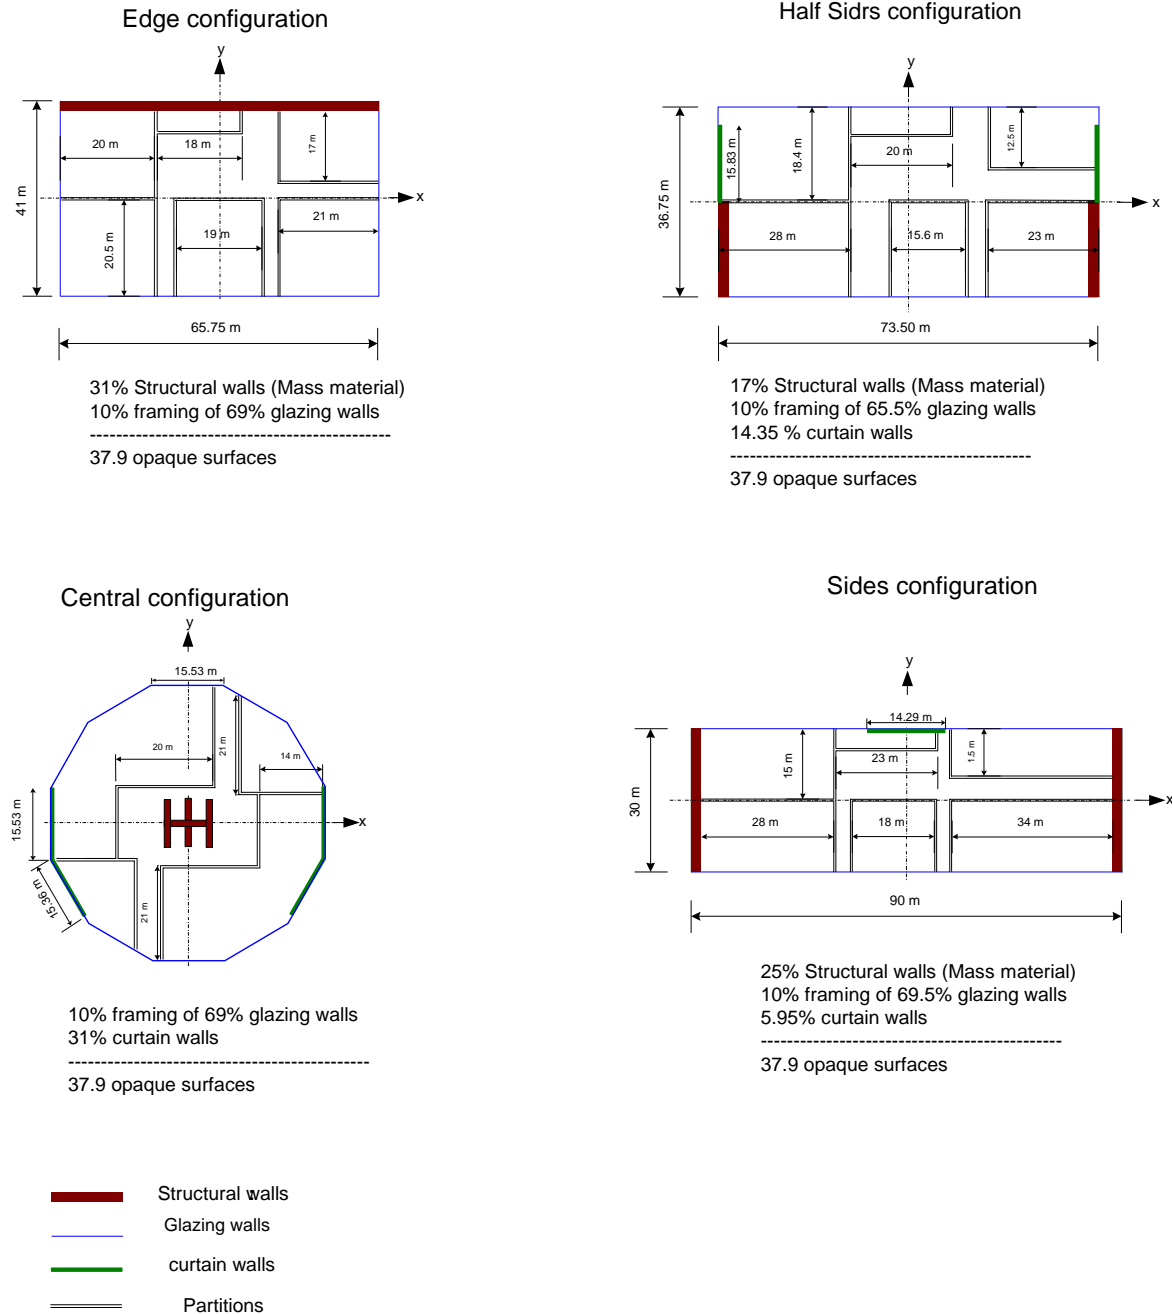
Plan views and an elevation of the buildings (EPO)
